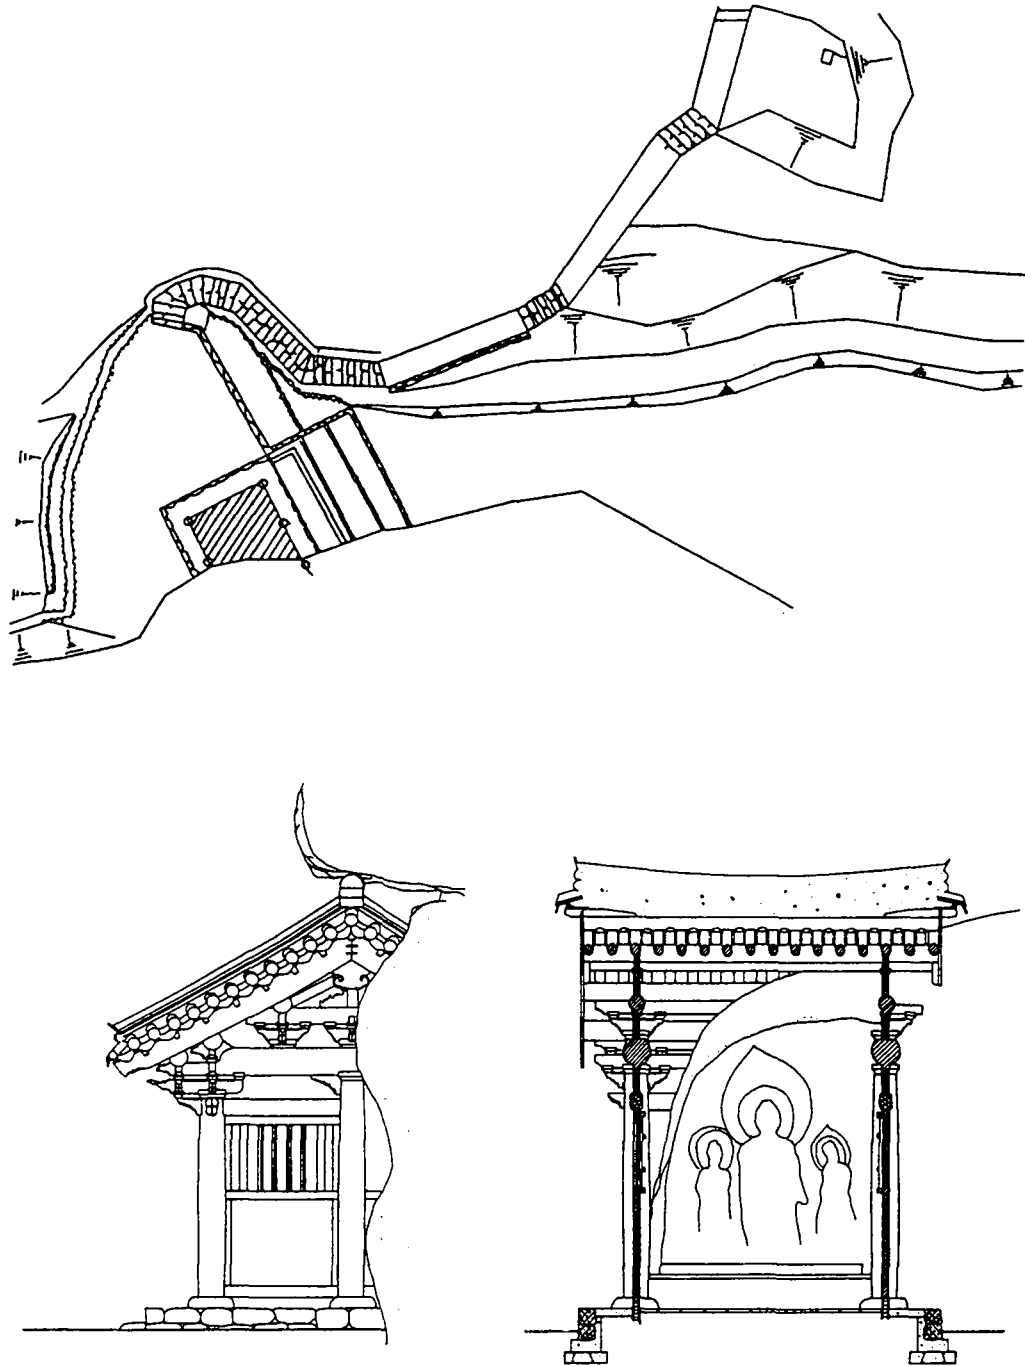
Layout plan (scale: 1 : 300), right lateral elevation and longitudinal section (scale: 1 : 100) of the new protection structure for the Sŏ-san Buddhist triad 瑞山磨崖三尊佛 서산마애삼존불 (1994 AD) (after: *MHCSRBS* 94 - 1, pp. 504 - 506)
